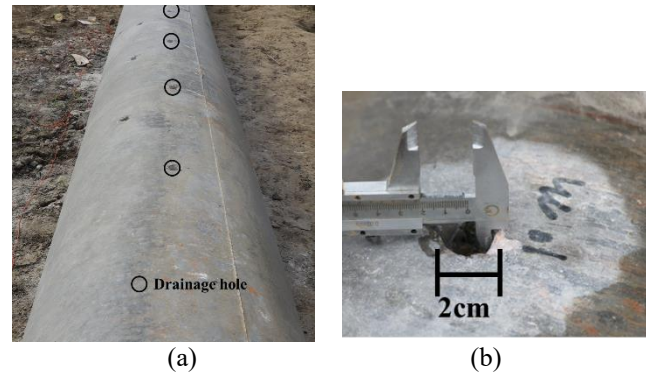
Photos of the permeable pipe pile (a) drainage hole position and (b) drainage hole size
